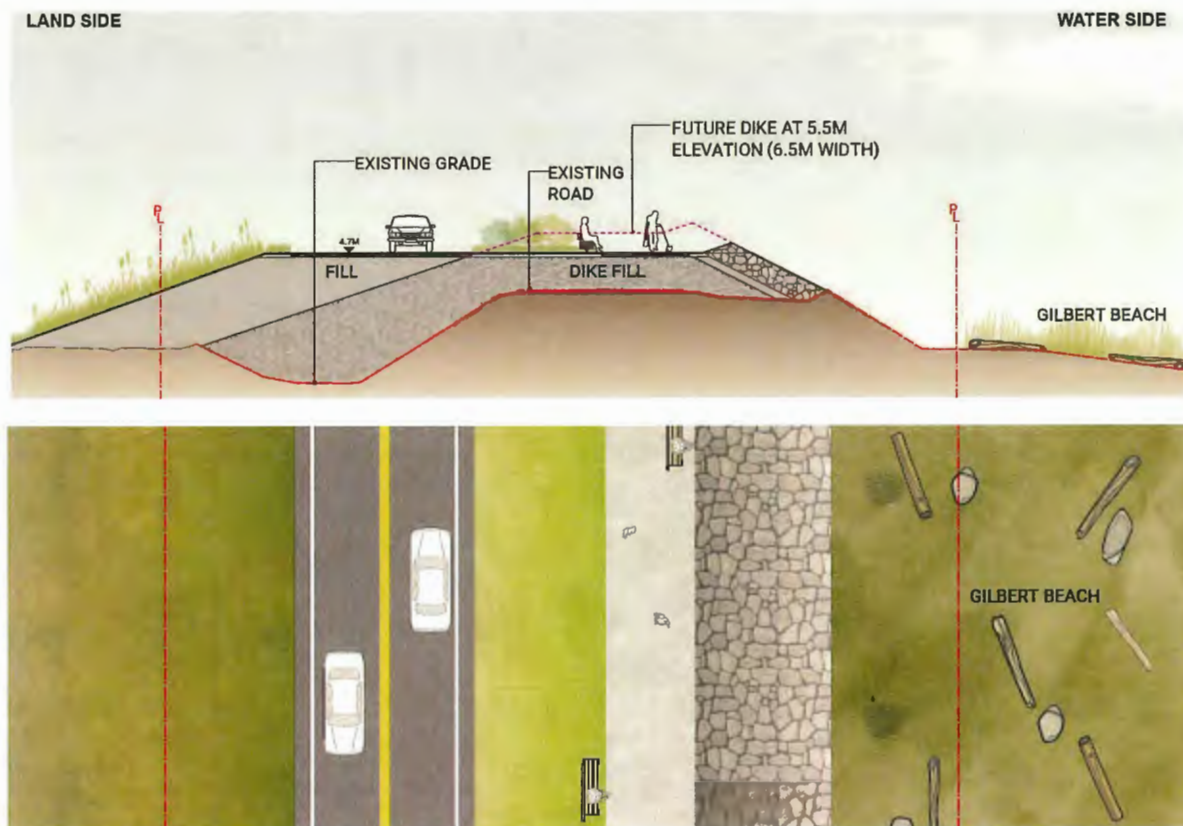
Section C – Section and Plan View of the Preliminary Dike Design East of London Farm
